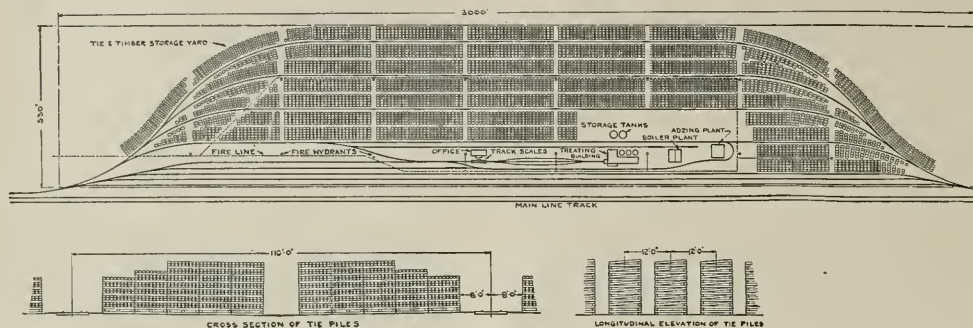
PLAN SHOWING LAYOUT OF ENTIRE PLANT
